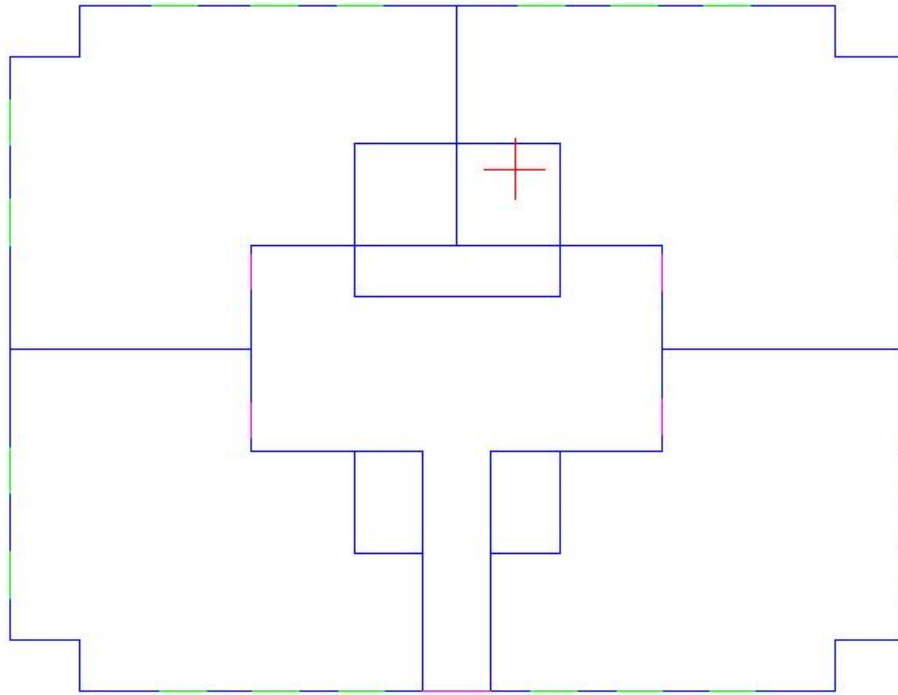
Ground Floor Plan of the Building in IES VE.
